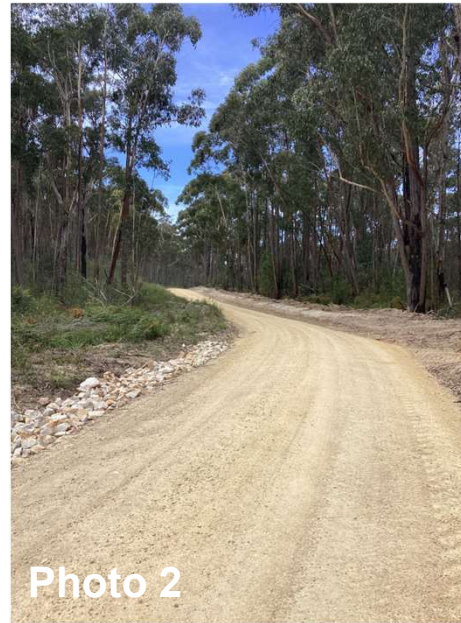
and 2 shows recent road repair works completed by PV on Point Hicks Road.
